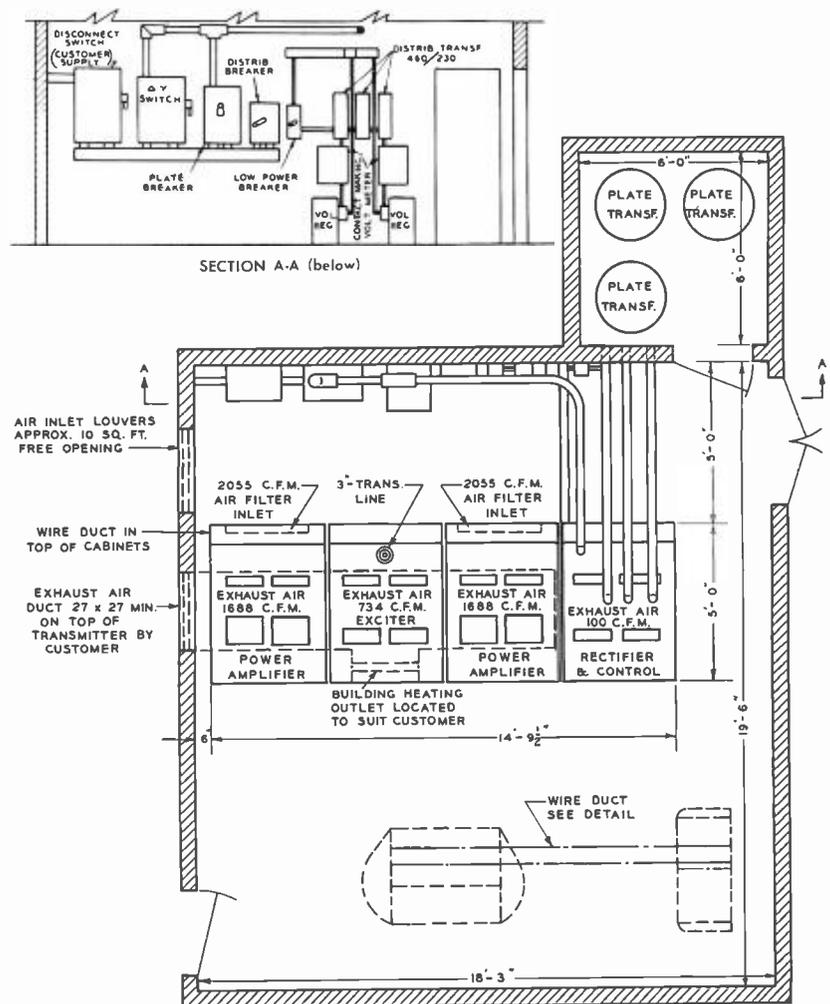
Typical Floor Plan. Note: The above Floor Plan is for idea of arrangement only. Secure more accurate engineering information before proceeding with building plans.
